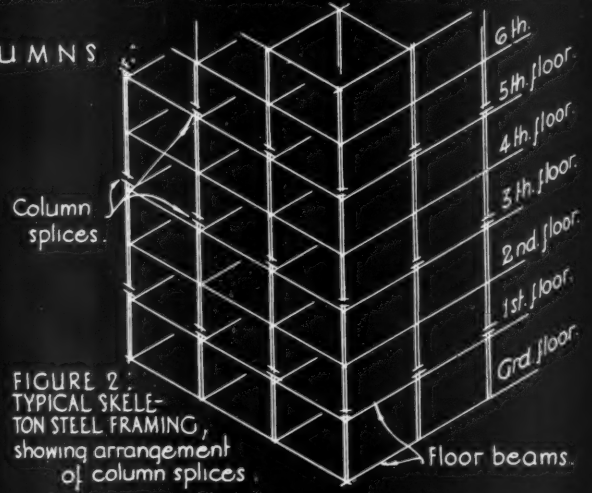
TYPICAL SKEL-ETON STEEL FRAMING, showing arrangement of column splices
